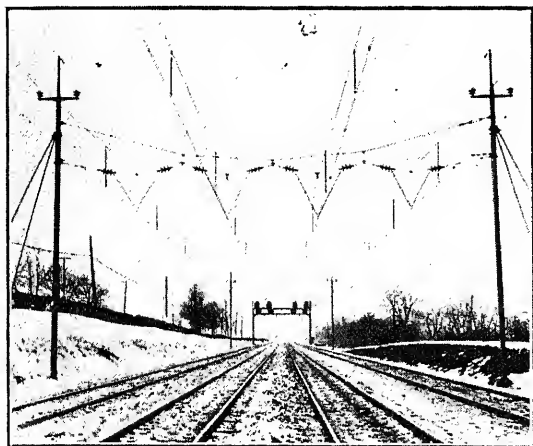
VIEW OF SPECIAL CONSTRUCTION ON TANGENT TRACK
